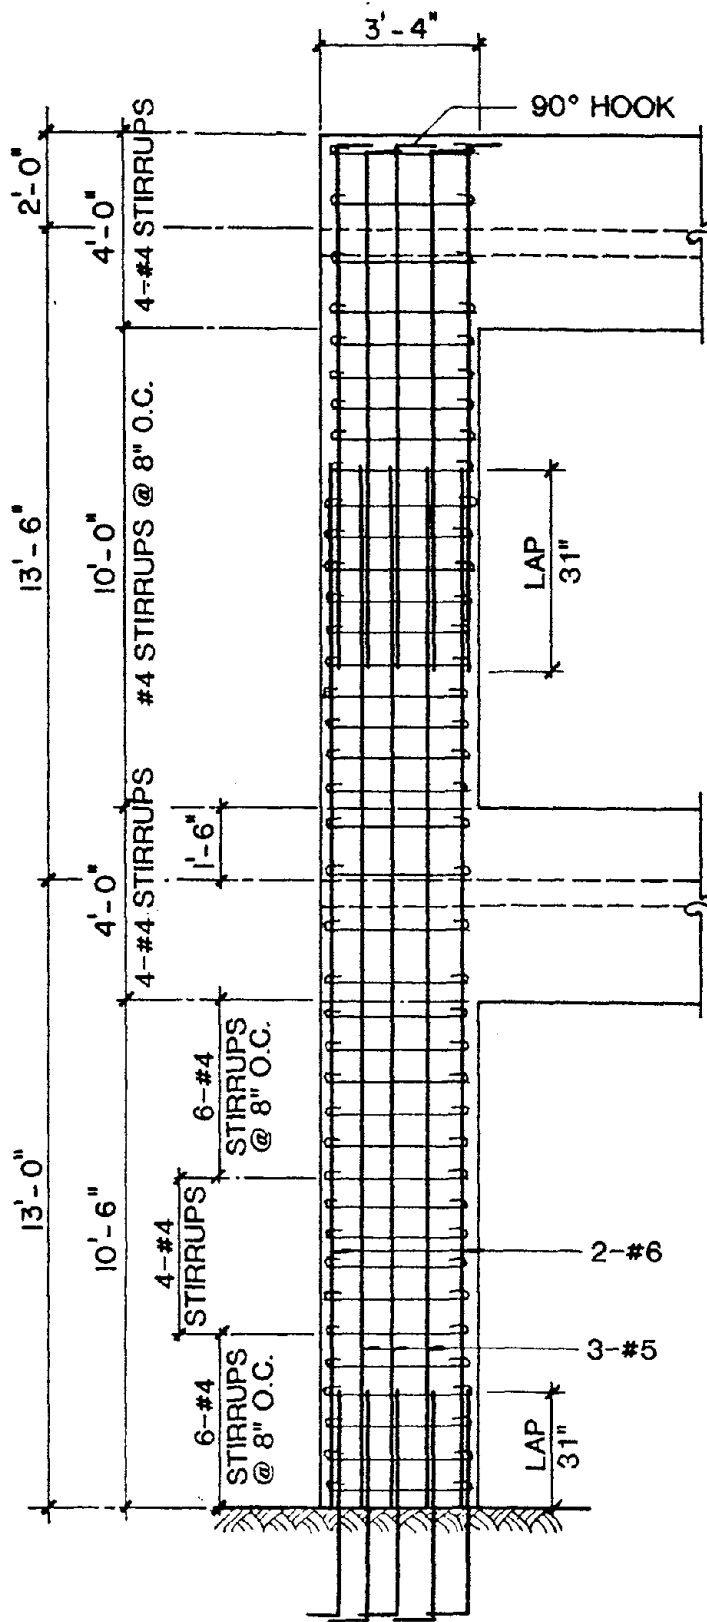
Beam Reinforcement (8-inch Wall Frame LSDS Design)
